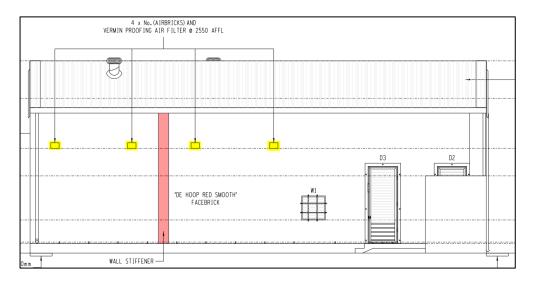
Excerpt from elevations showing airbricks and brick stiffeners
